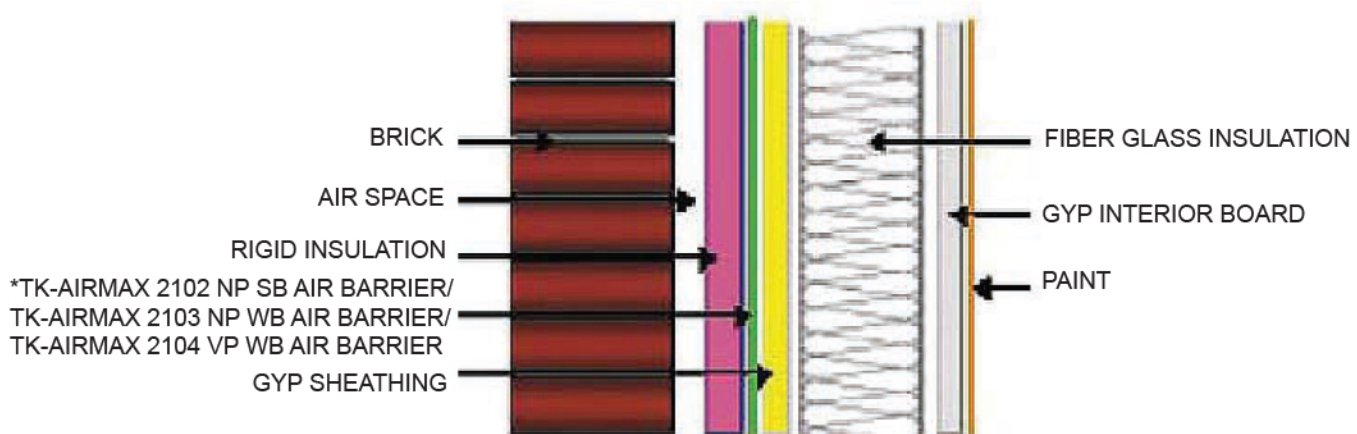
BRICK VENEER W/INSULATED STUD BACK UP WALL
